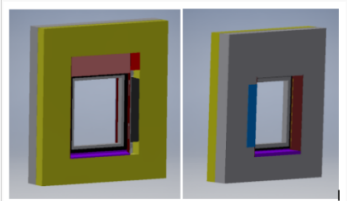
View of the prefabricated installation solution for the renovation. View from outside (left) with sun/privacy protection and window plate as well as ventilation device and outside/exhaust air outlets on the right in the window reveal. View from inside with window sill (right), the air outlet for the supply air would not be necessary for this window as the device itself has a supply air outlet.
